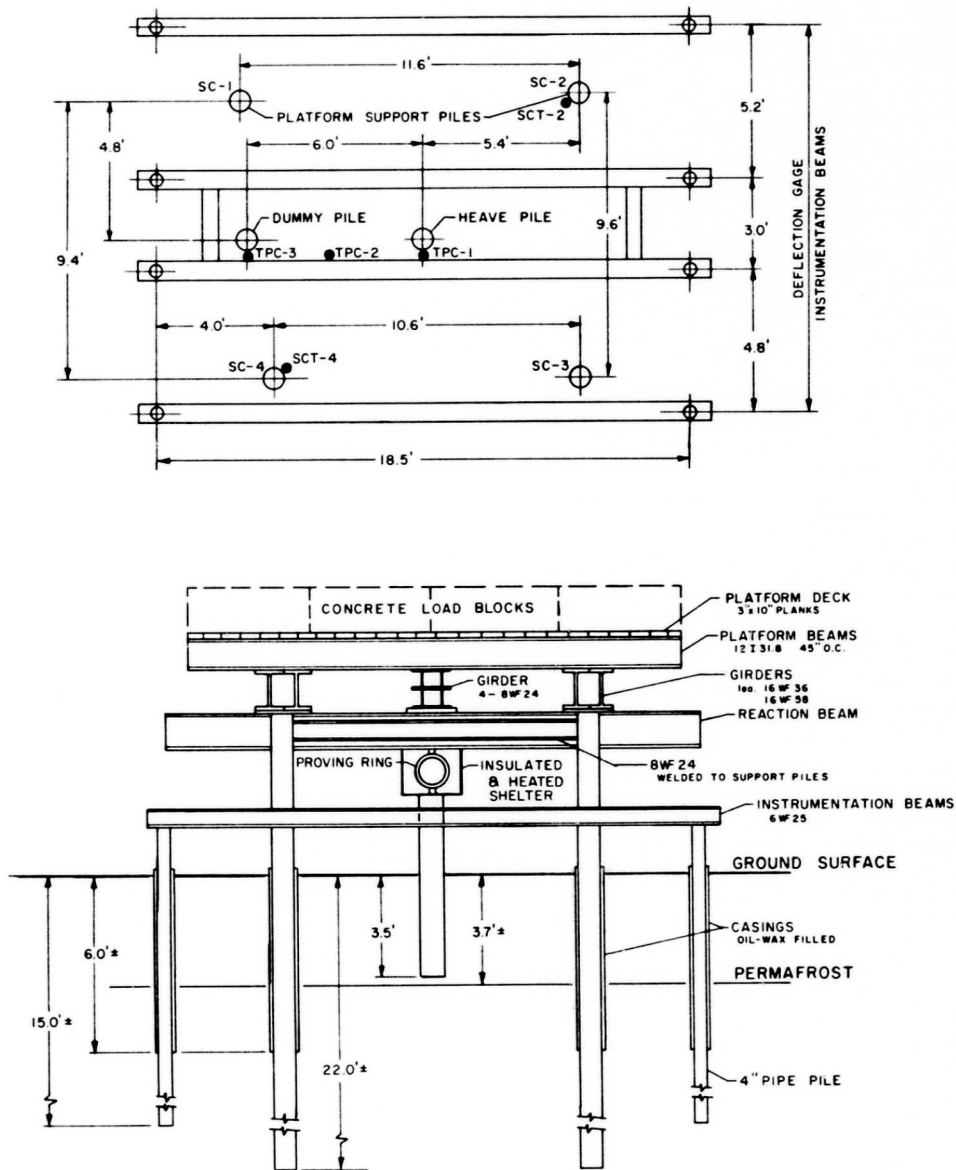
Plan and elevation view of 1958-59 heave test installation.
